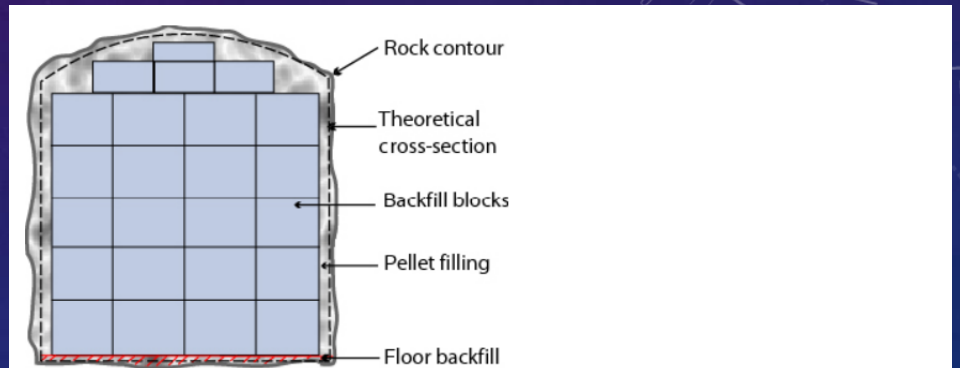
Cross section of a backfilled KBS-3V deposition tunnel showing the three main components of the backfill. 1) precompacted blocks, 2) pellet fill and 3) material placed under the blocks to provide stable foundation for the blocks (Keto et al. 2009a).
